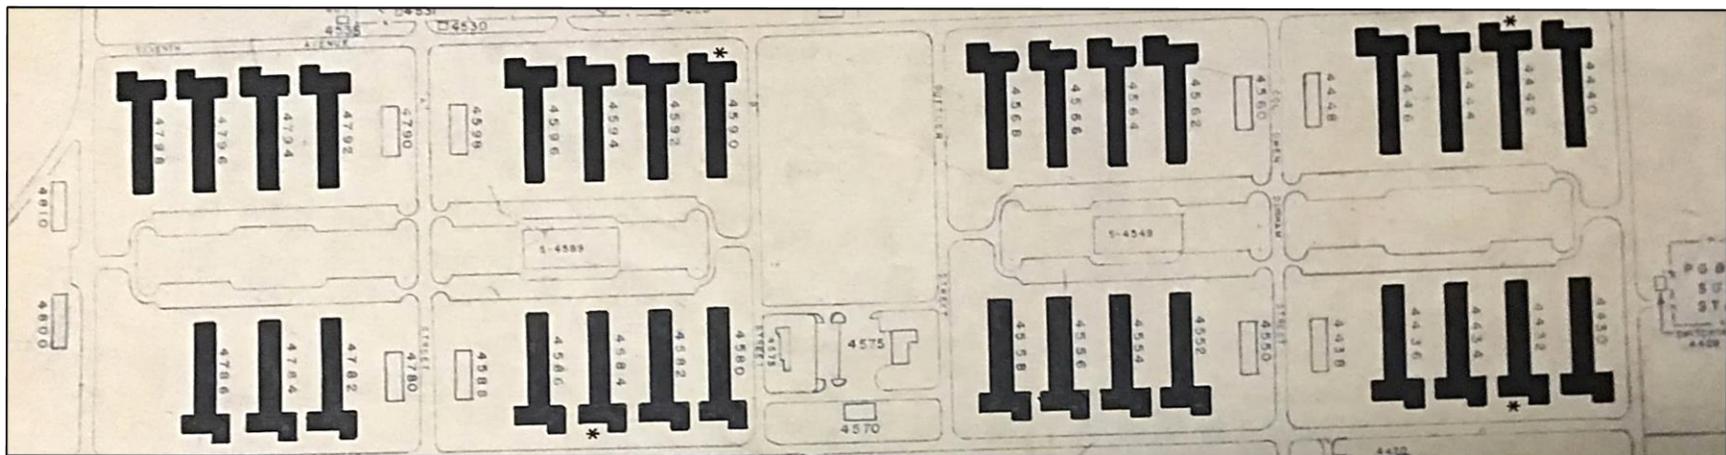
Fort Ord architectural site plan of the Hammerhead Buildings/Barracks (CSUMB Facilities 2021).
